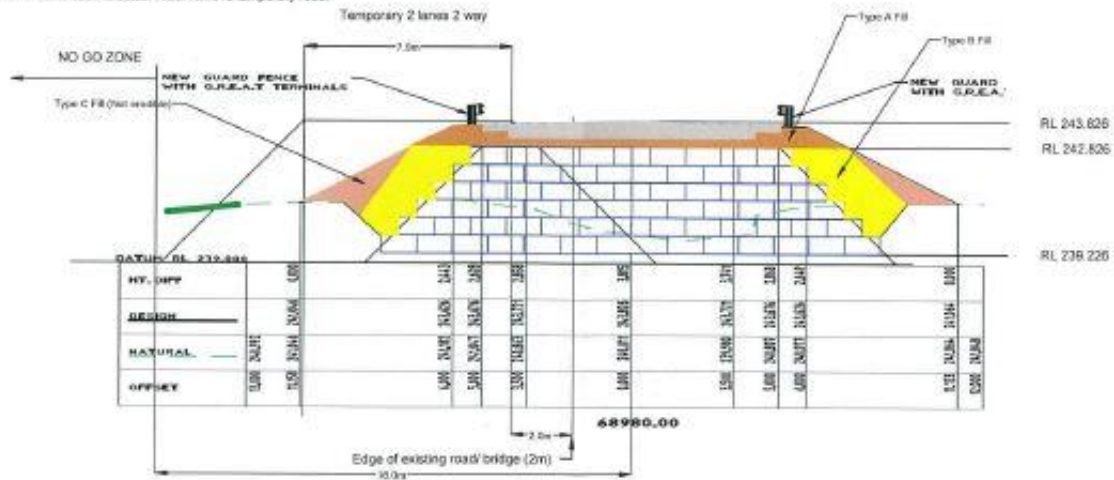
Innovative design at its simplest best. Expanded PolyStyrene (EPS) blocks are to be used under the floodway structure as there is no acceptable way to remove the structure for surcharging and keep the road open.
